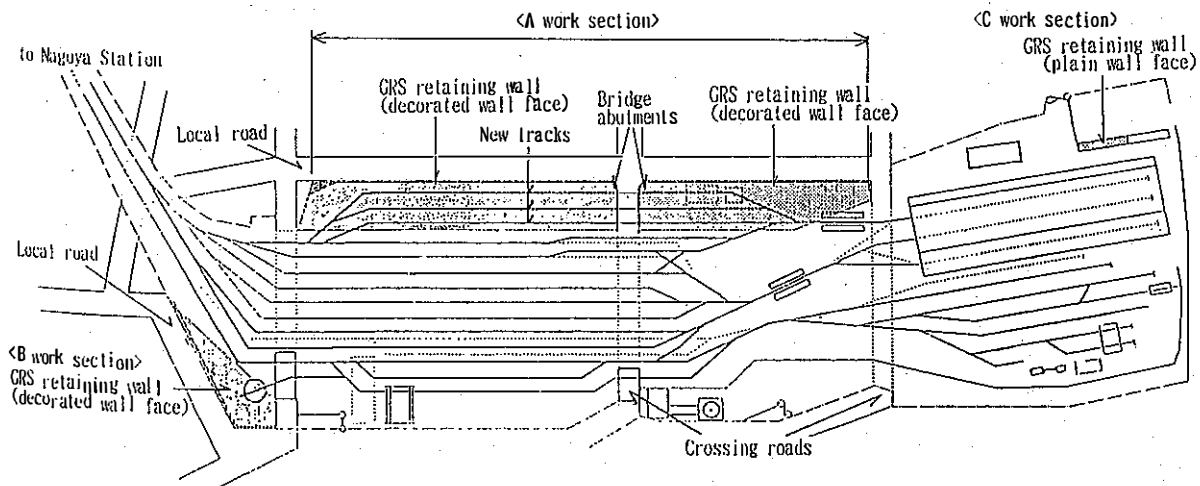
Plan of Nagoya depot yard site showing the places using the GRS retaining walls
